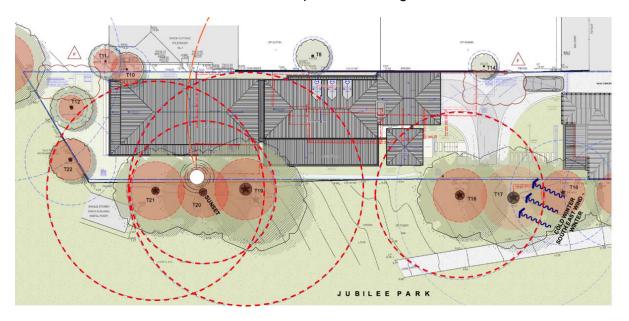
Site plan depicting Dwelling 2 footprint, and tree protection zone of Jubilee Park trees shown with red dashed circles
